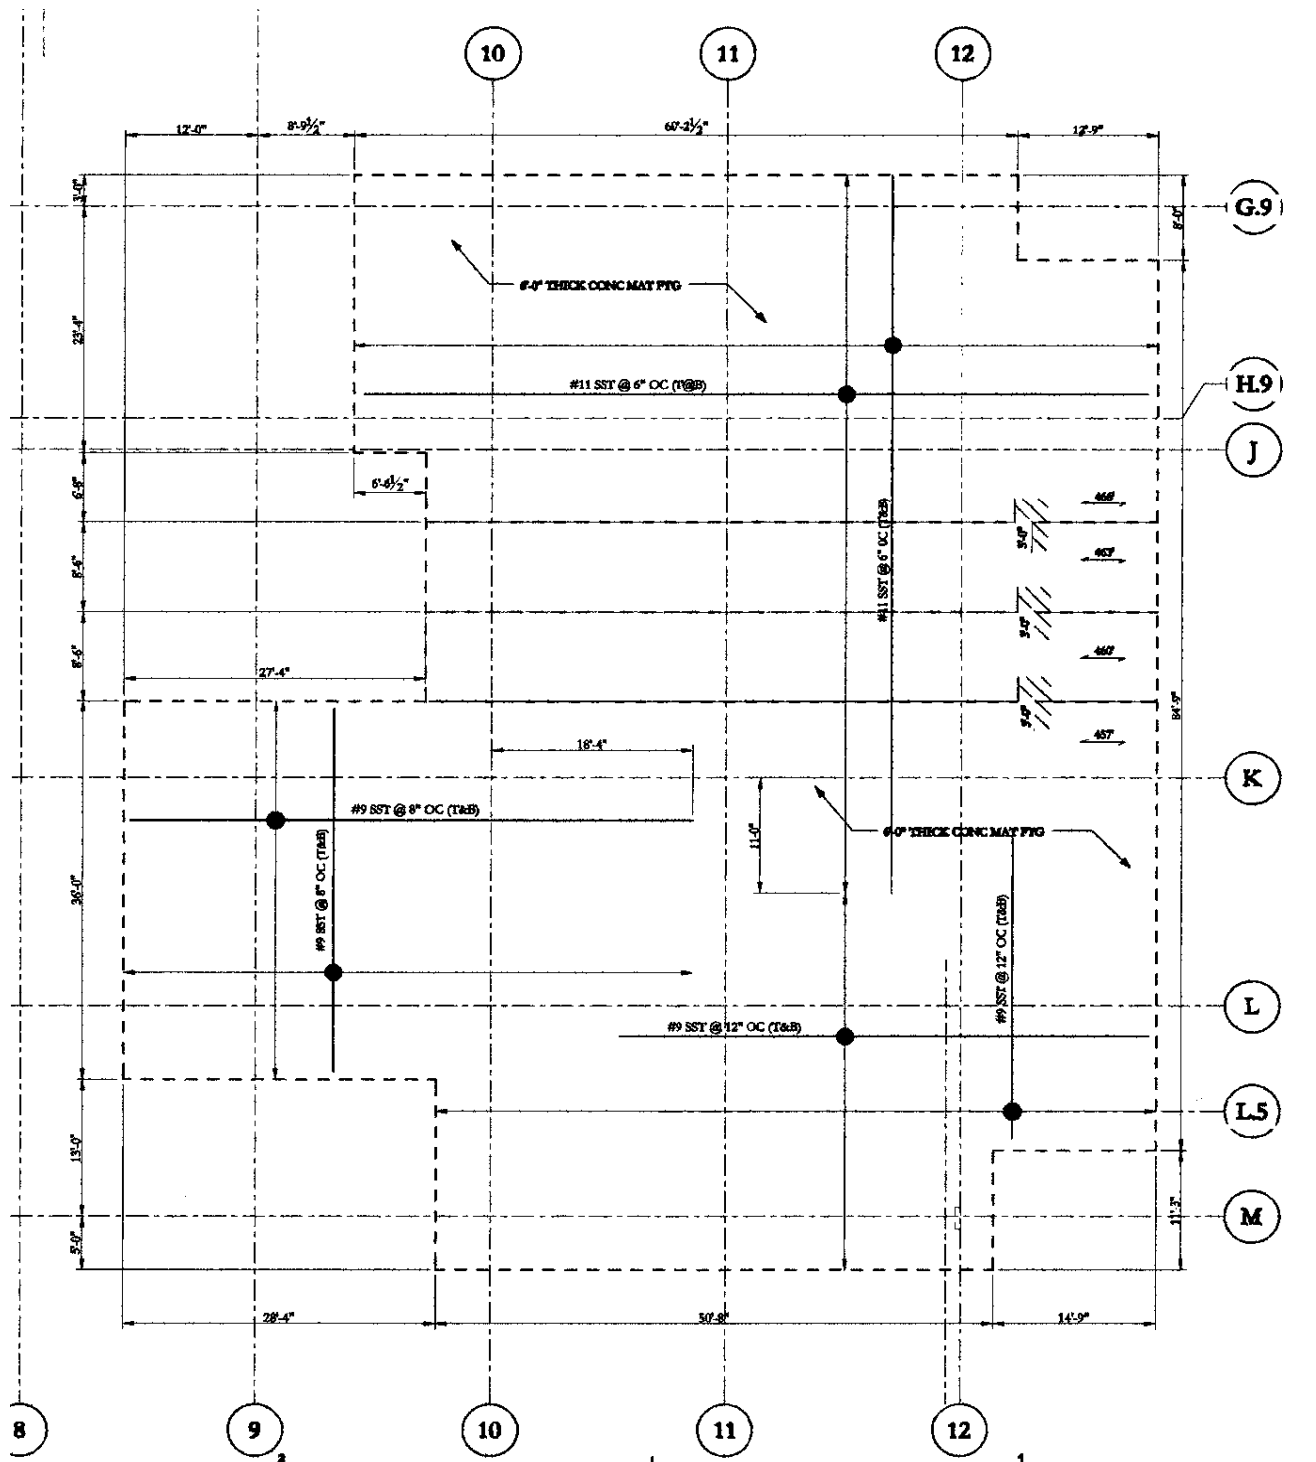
Typical Mat Foundation under Imaging Equipment
